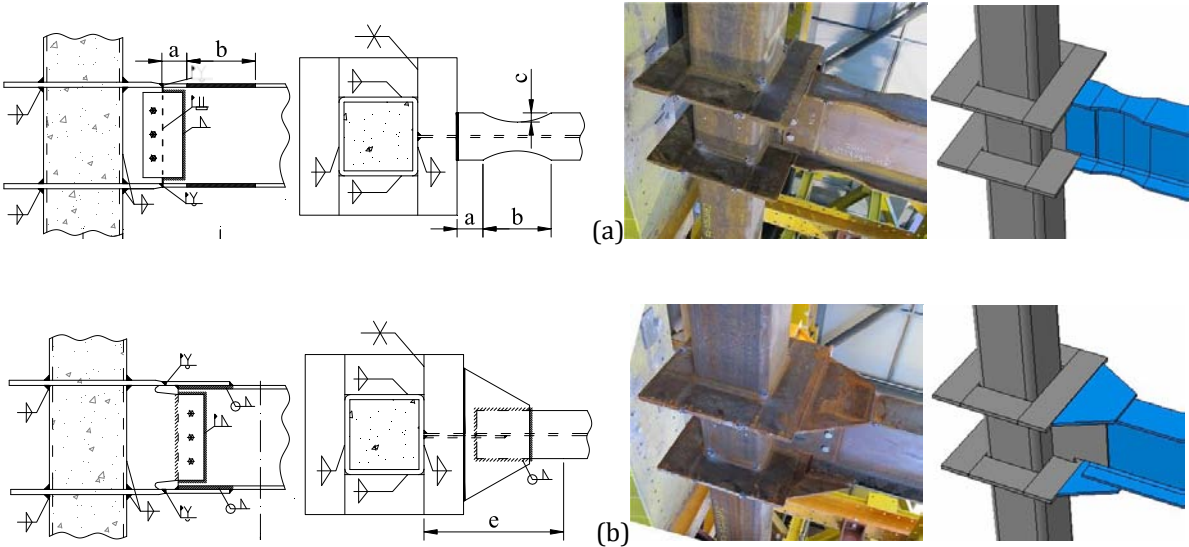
Configuration of the designed beam-to-column joints: with reduced beam section (a), and with cover plates (b).
